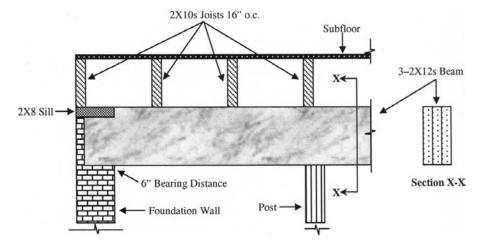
Floor framing detail (Section AA from Fig. 11.2).
